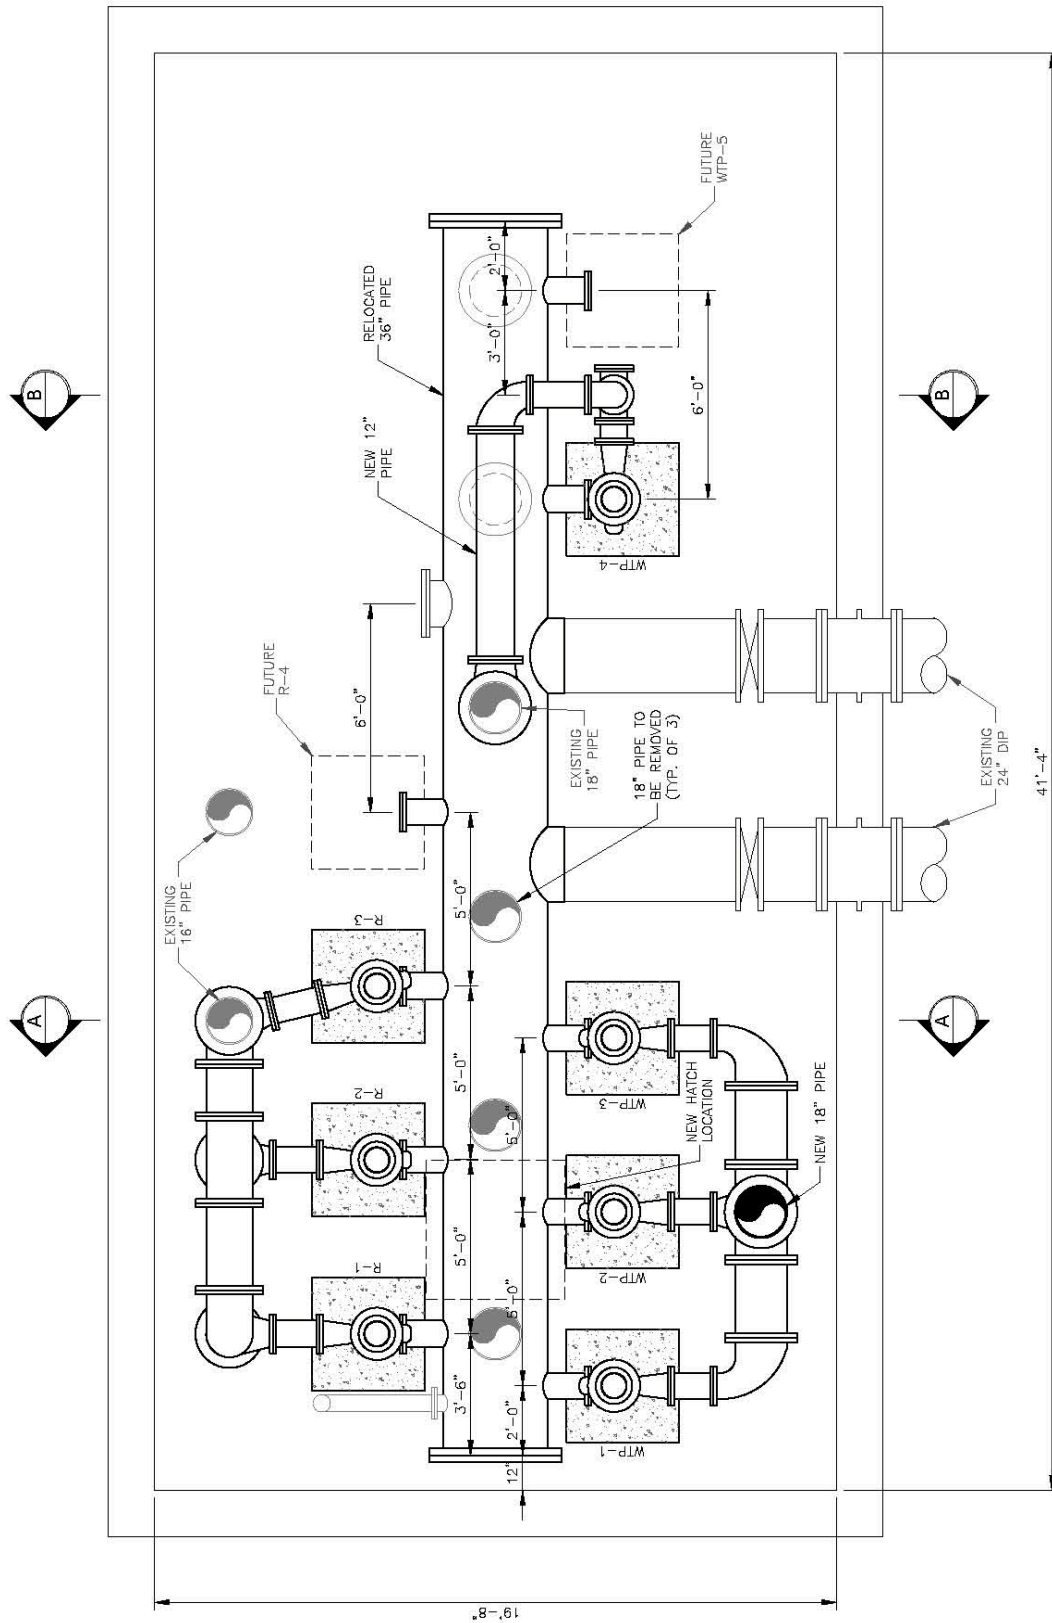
Dry pit submersibles installation, plan view of lower level of pump building
